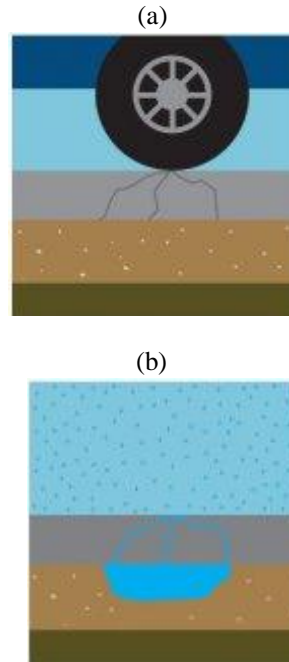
(a) Cracks formed on road from repeated traffic loading, sub-base weaknesses, or poor asphalt quality
